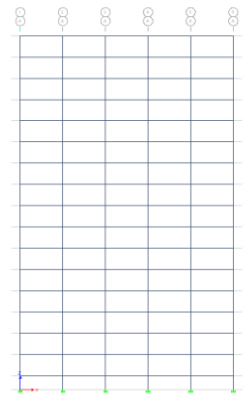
elevation of structure-1 resting on 0° ground slope
